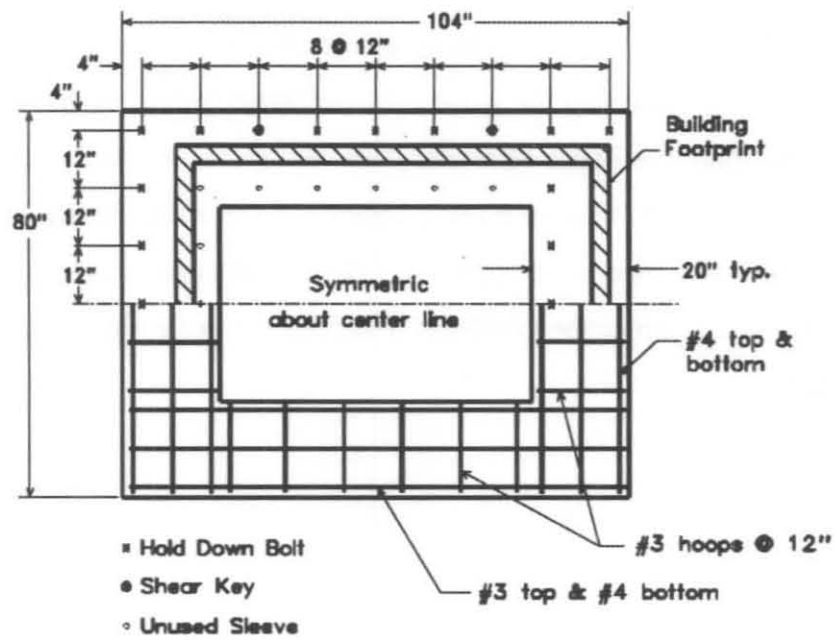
Plan View of Foundation Pad Showing Hole Patterns and Reinforcement
